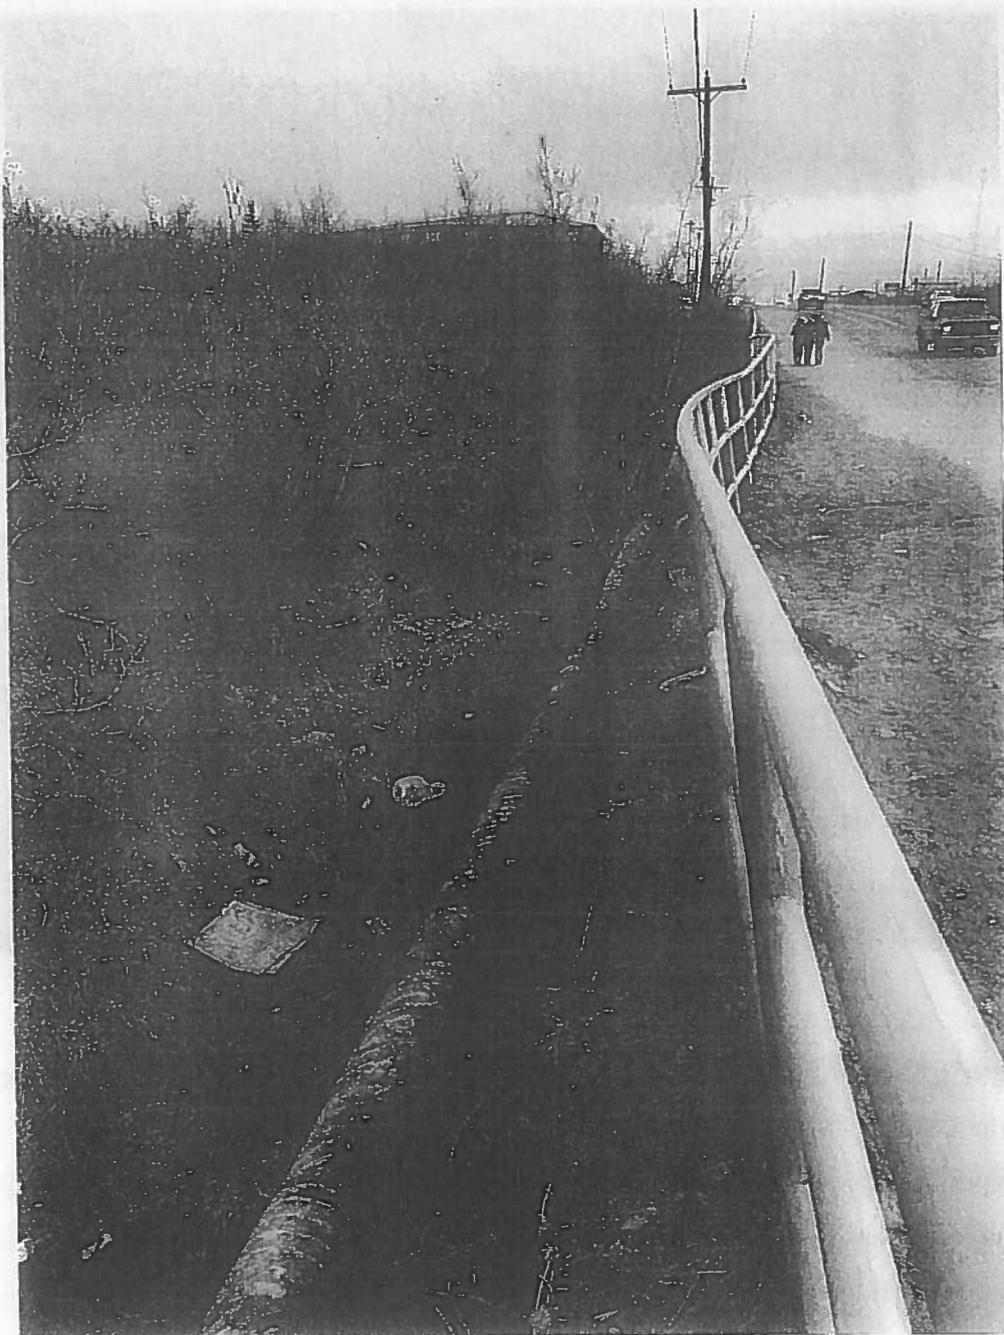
Existing Sewer Main Traveling South Along Ridgecrest Drive
